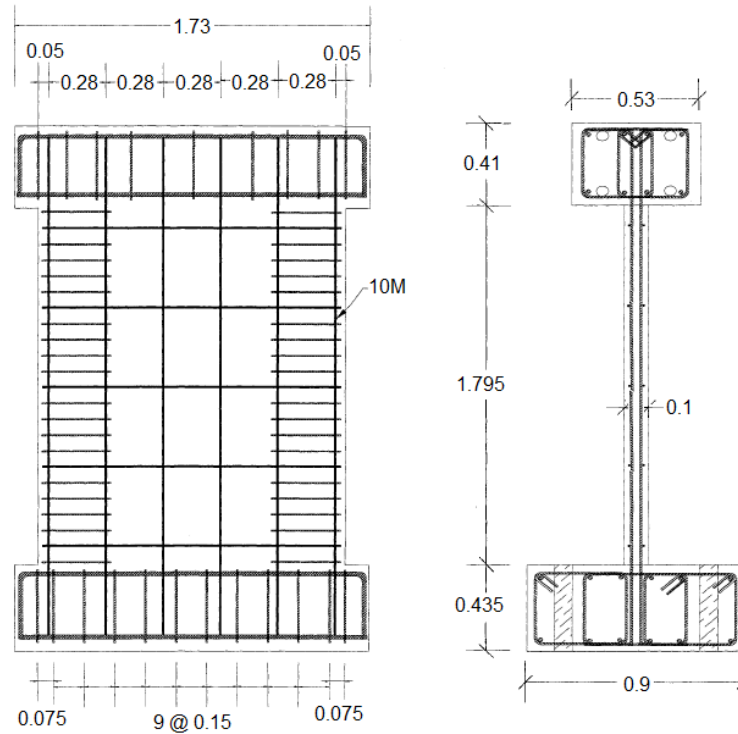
Geometry and reinforcement details of shear wall specimens (Lombard et al., 2000)
